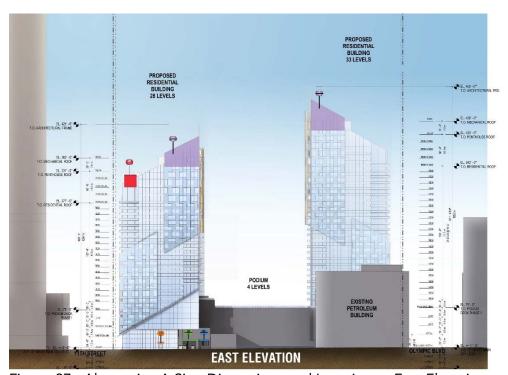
Alternative A Sign Dimensions and Locations – East Elevation
